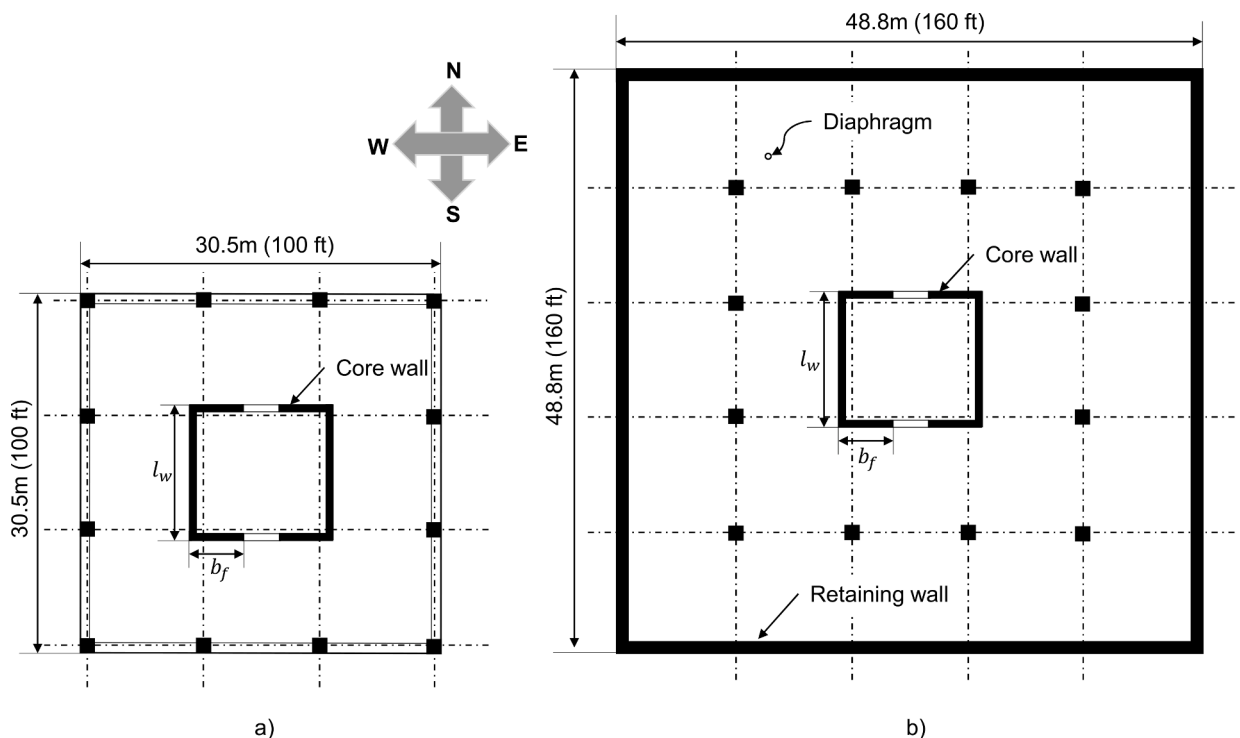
Plan views of a) typical floors and b) basement floors [40,41].
